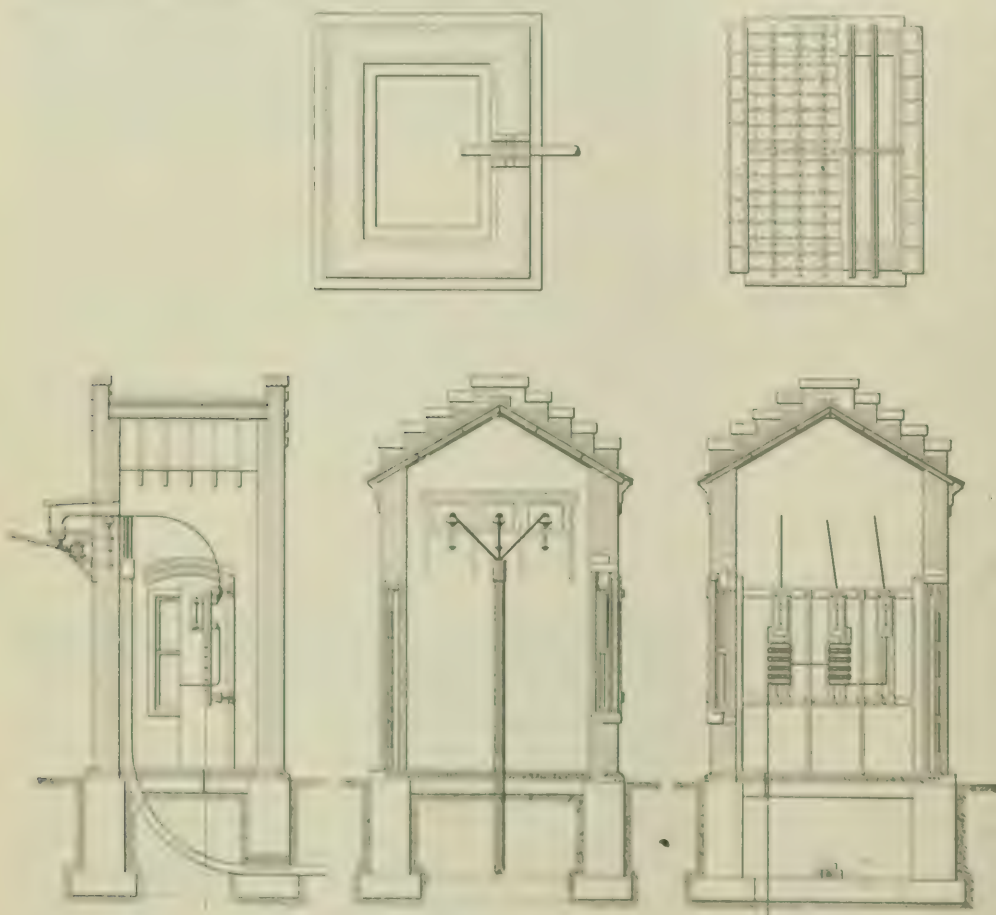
PLANS AND SECTIONS, CABLE TERMINAL AND LIGHTNING ARRESTER HOUSE, PISCATAQUA RIVER CROSSING.
